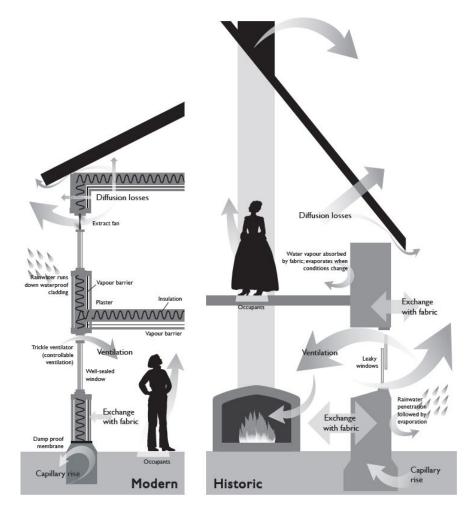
Typical differences in the movement of moisture between an historic building (right) and a modern building (digital image by Robyn Pender)(bui)
